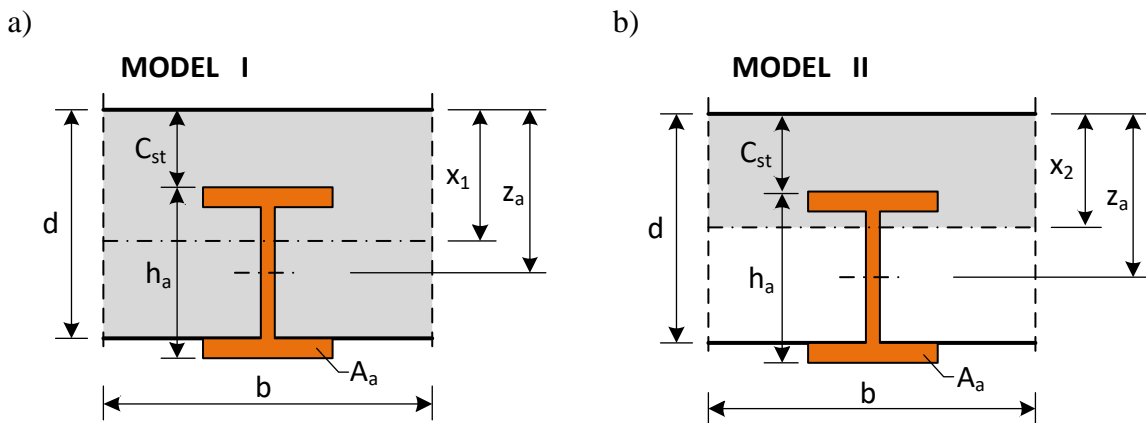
Definition of the dimensions of the cross-section bridge deck with concrete-encased steel beam: a) interaction of concrete in the tension zone (concrete is uncracked), b) the concrete in tension is cracked
